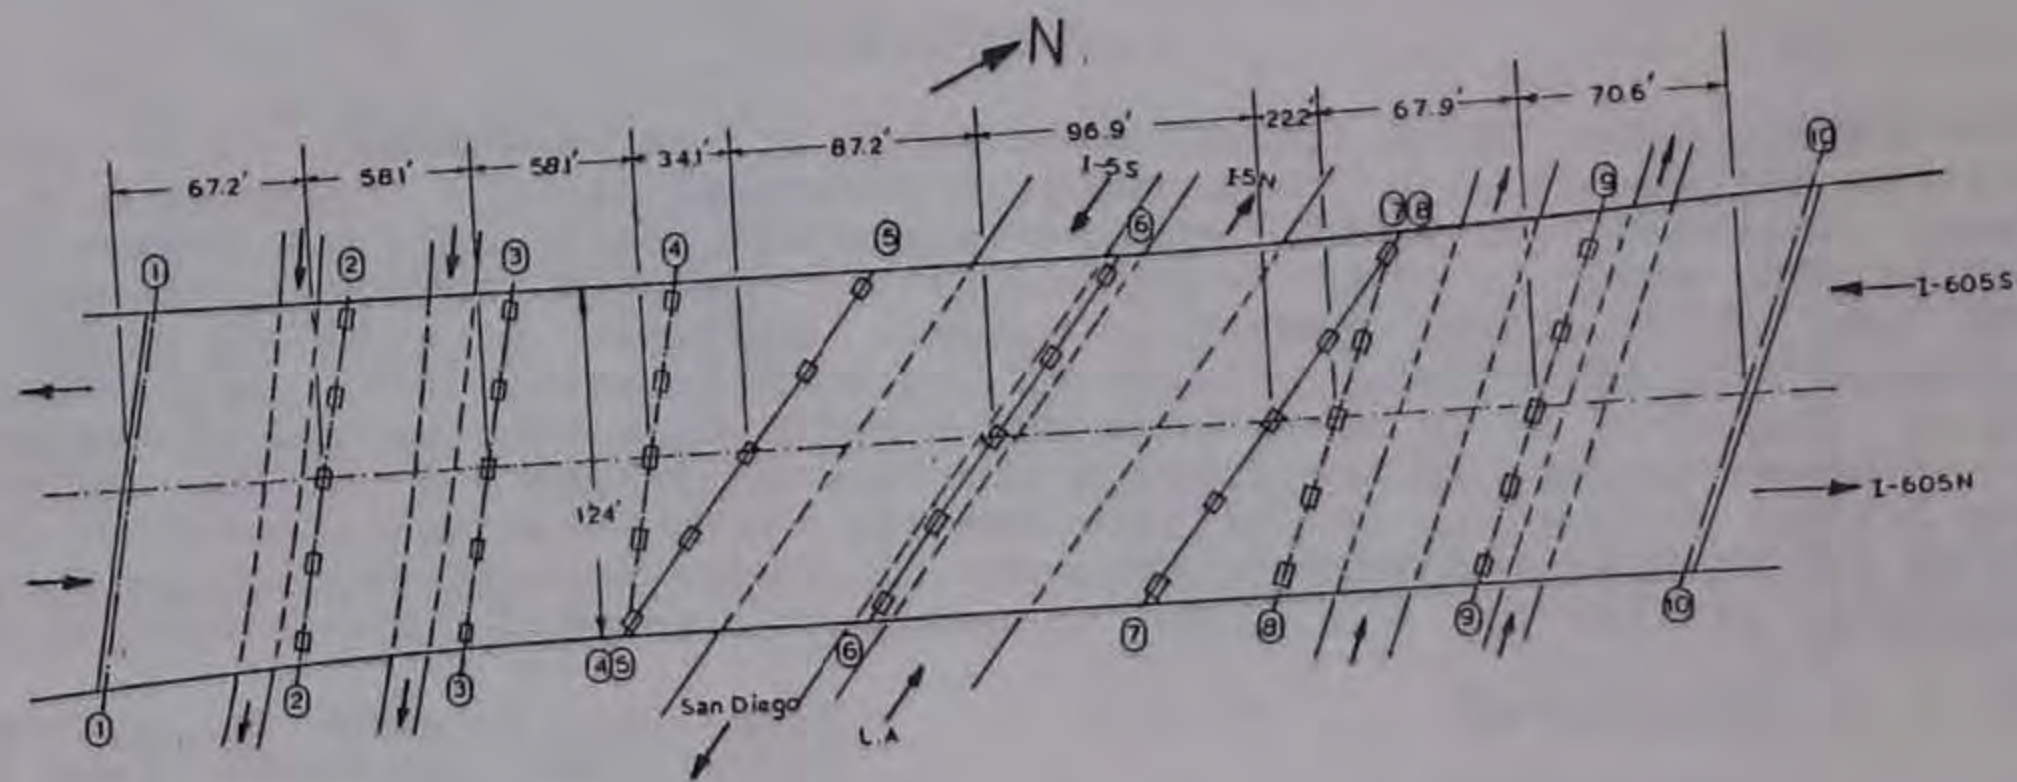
Plan View of I-605 Overpass Structural Configuration
